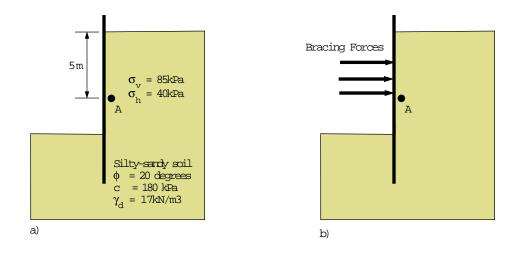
a. Sheetpile wall to retain a dry silty-sandy soil, with the initial stress at point A; and b. Force exerted on the wall leading to increased horizontal stress at point A.
